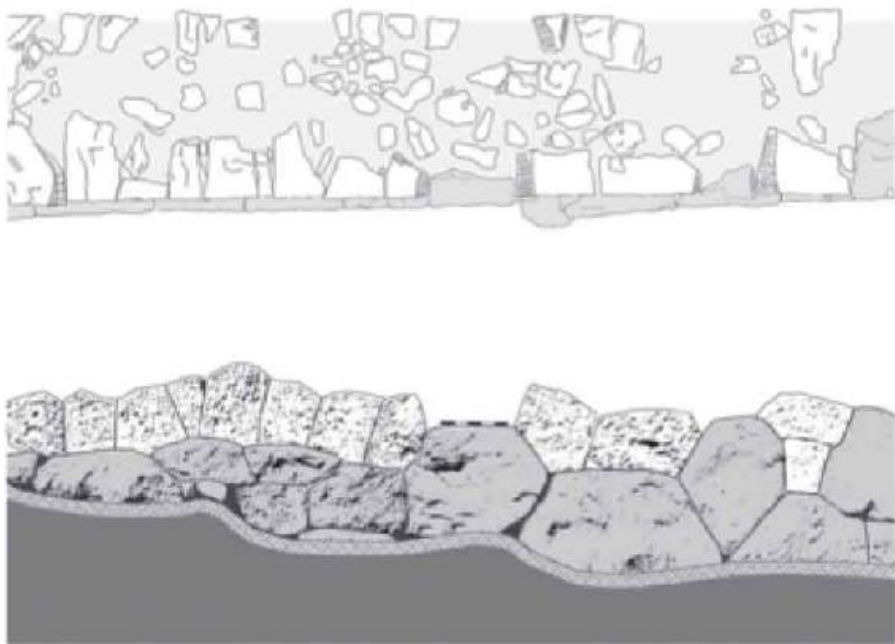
Partial plan and elevation of the eastern wall of the fort (Larisa East) (© Archive of Larisa (Buruncuk) Project).
